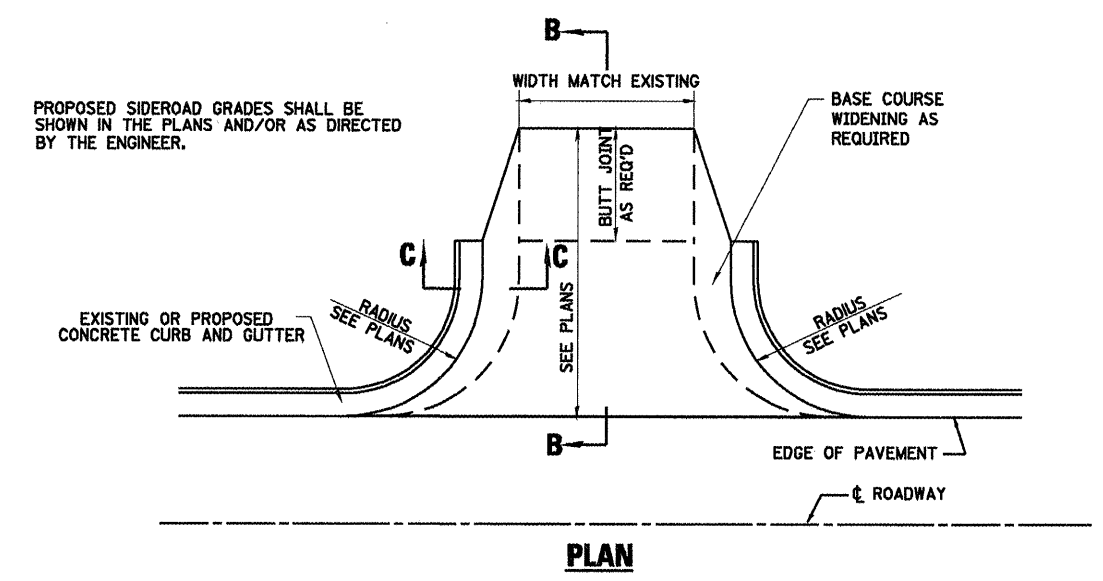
DETAIL A - URBAN SIDEROAD RETURN (REBUILDING)
